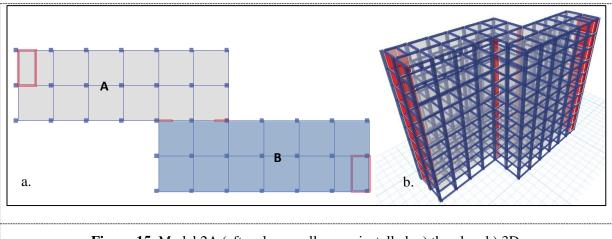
Model 2A (after shear walls were installed: a) the plan, b) 3D.
